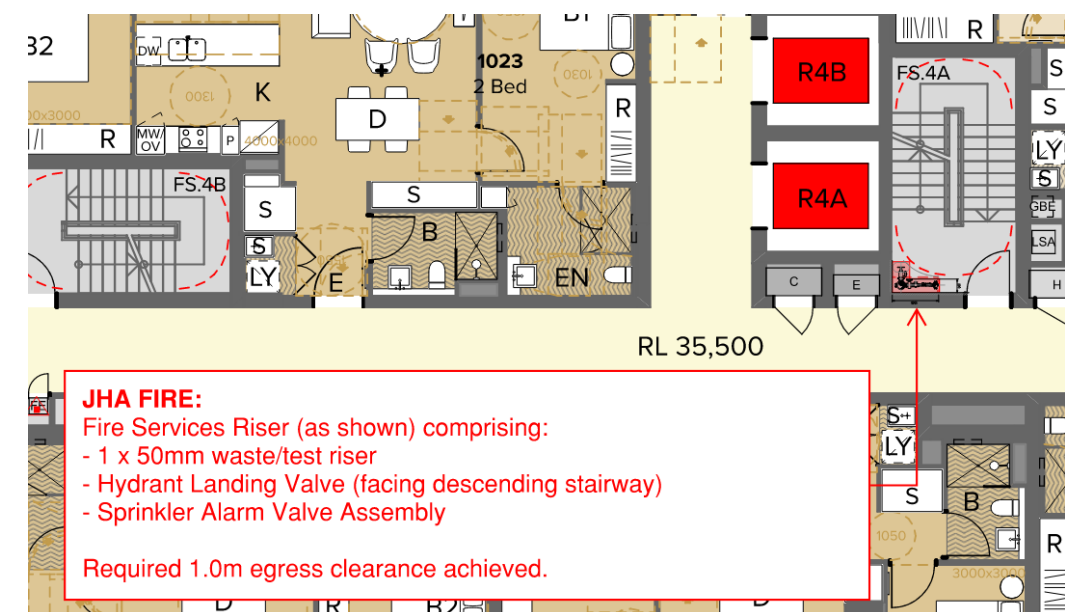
Typical Sprinkler Control Valve Assembly
